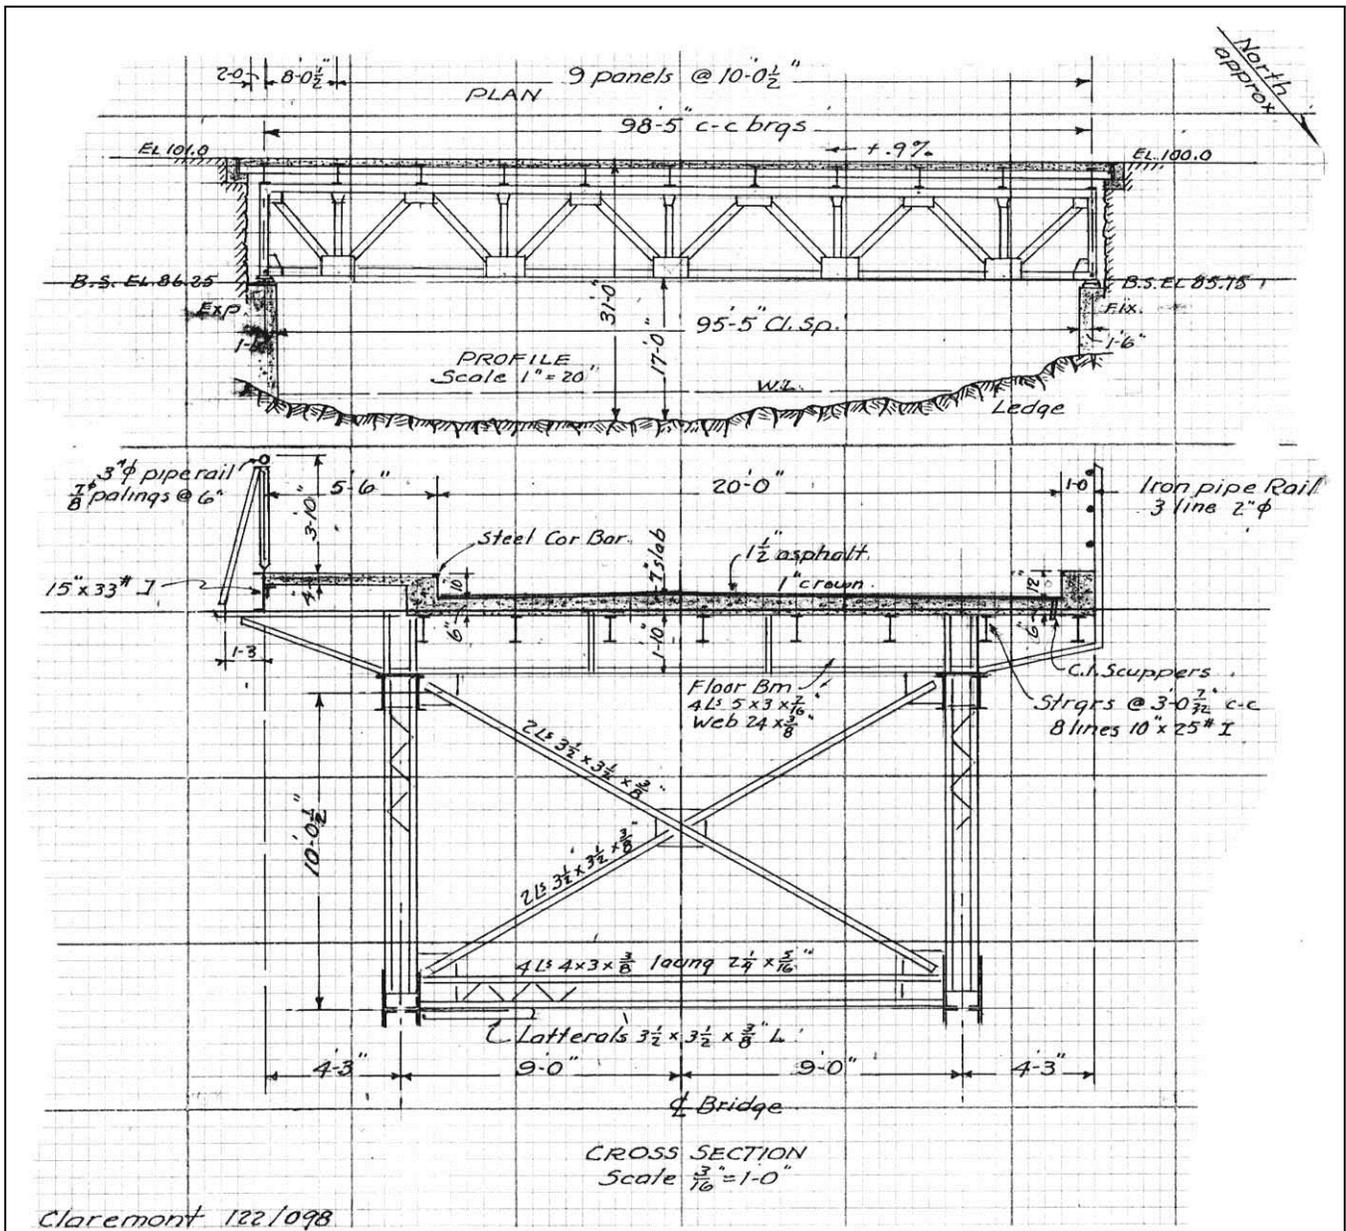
Claremont 122/098, "Lower Village Bridge" (1915). Elevation and section drawings made by NHH engineers following inspection of the bridge on November 19, 1940 (NHH Bridge Inventory Card).
